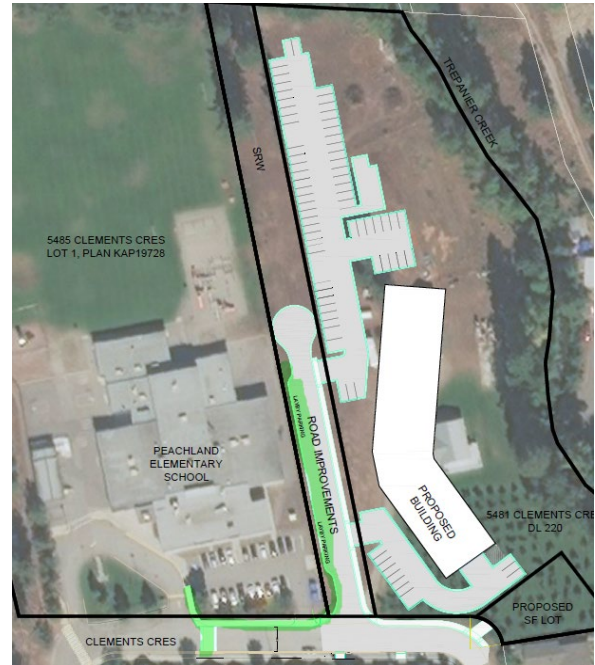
Proposed Road Improvements (offsite works highlighted in green)
